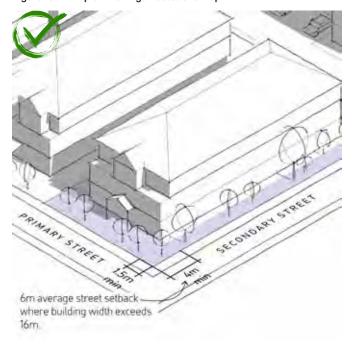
Multiple Dwellings - Street Setbacks Example Diagram
